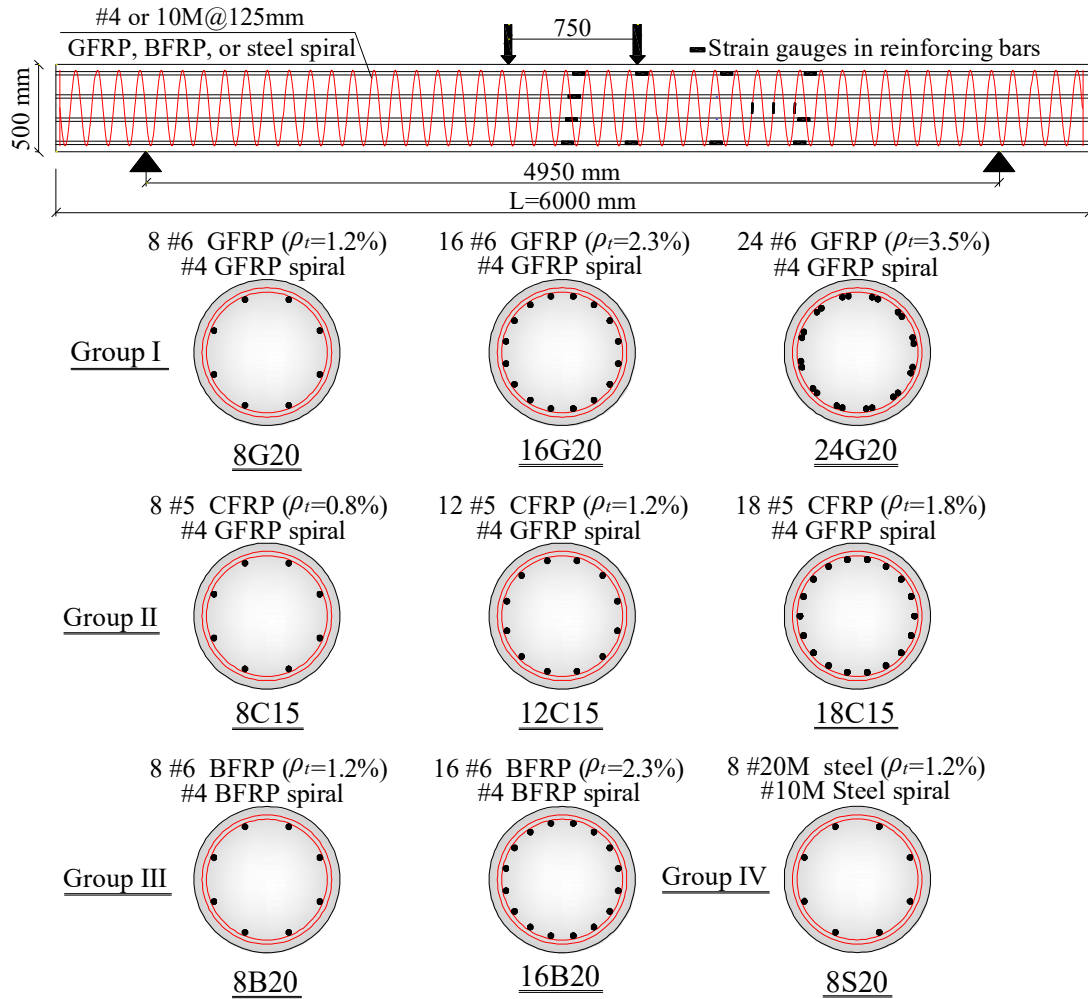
Dimensions and reinforcement details of the test specimens. (Note: all dimensions in mm)
